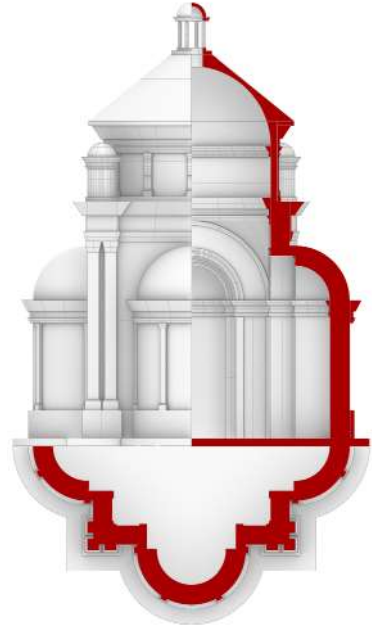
Plan, section and elevation (1:500) of the solution with a spherical dome and an exterior circle-based drum.
